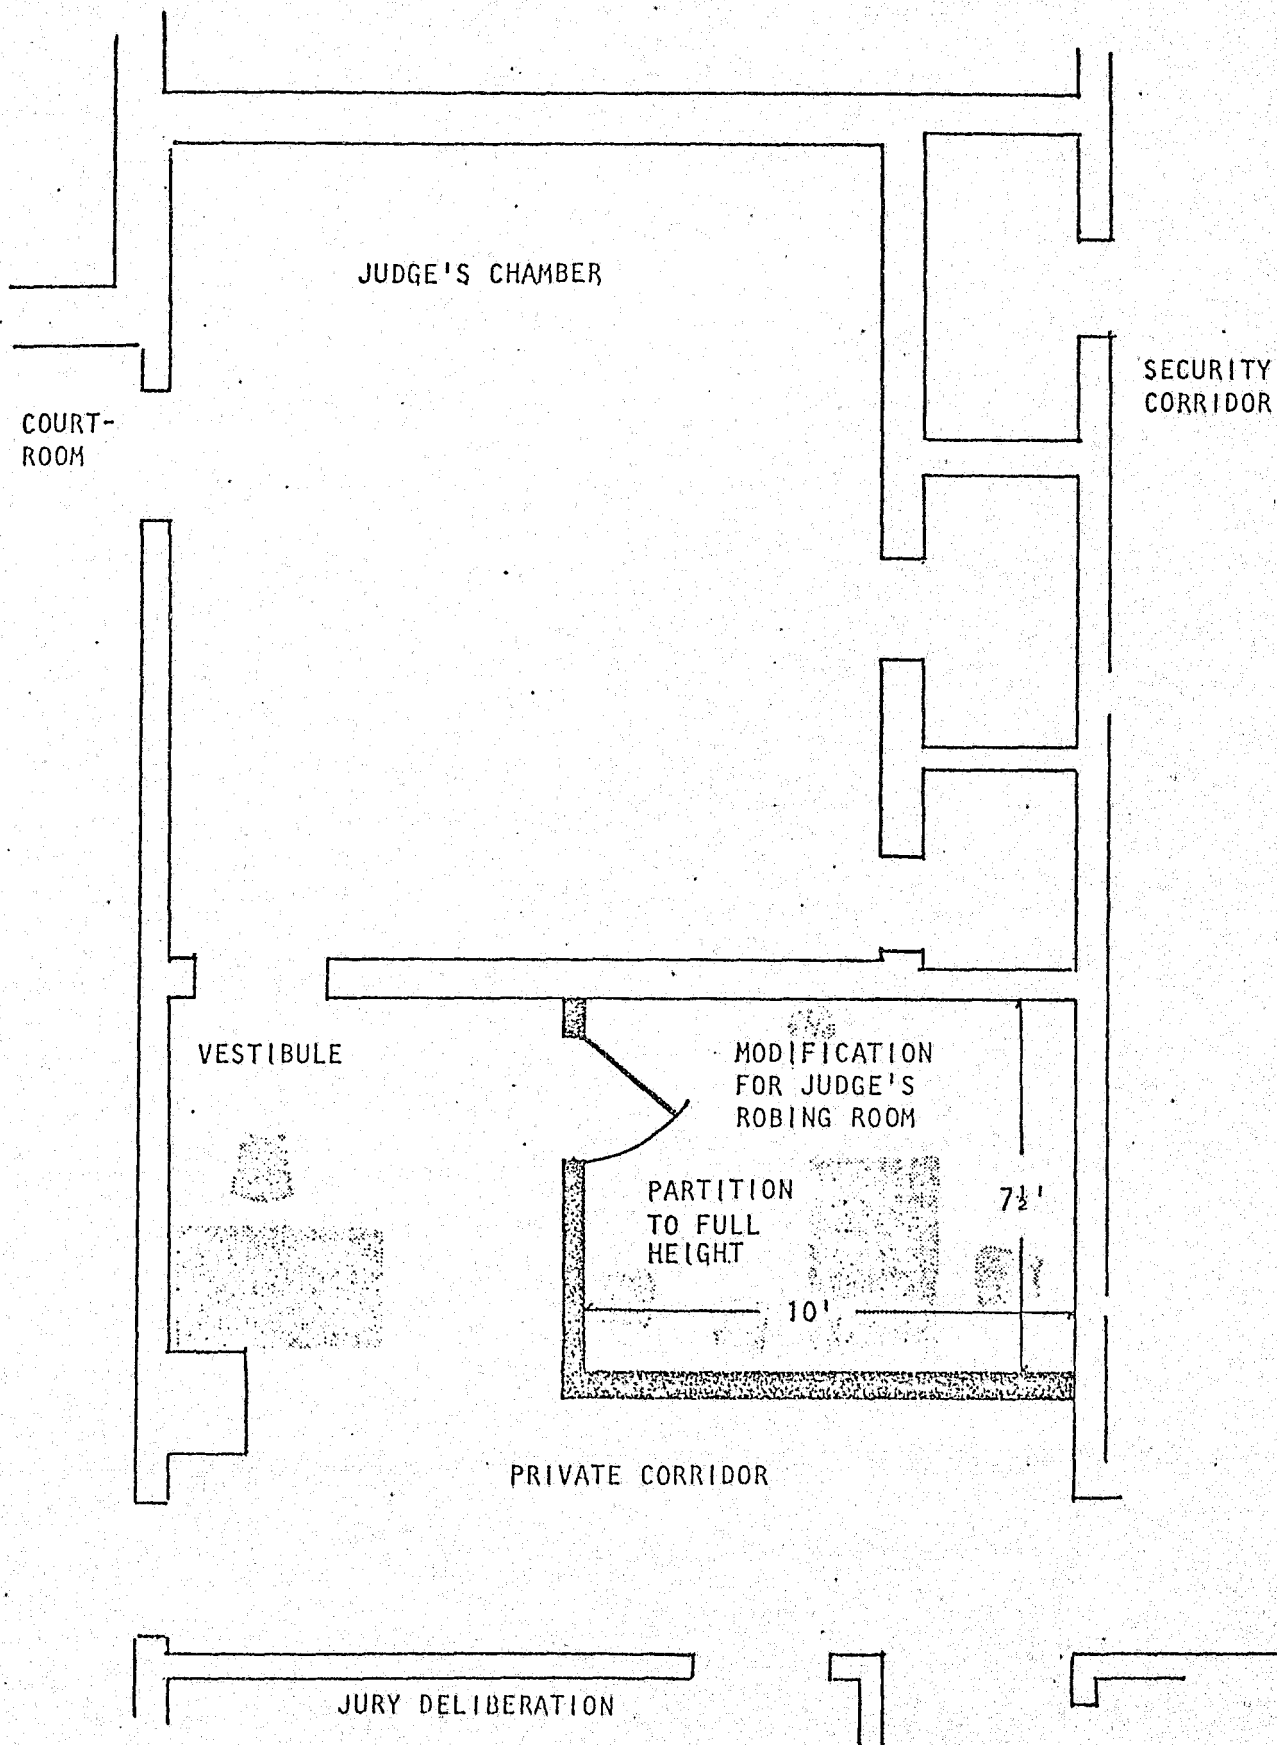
, 2 and 3 sketch plans for constructing robing rooms in the vestibules outside each chamber. The vestibules are presently used by bailiffs, one per judge, for reception and security purposes. Each modification shown is a minimal robing room with furniture locations noted as indications that the spaces will suffice. The rooms are minimal in size and amenities, e.g., the absence of toilets. If they are used extensively for case conferences, only one judge could be assigned, as space is not available in any of these locations for two robing rooms.
